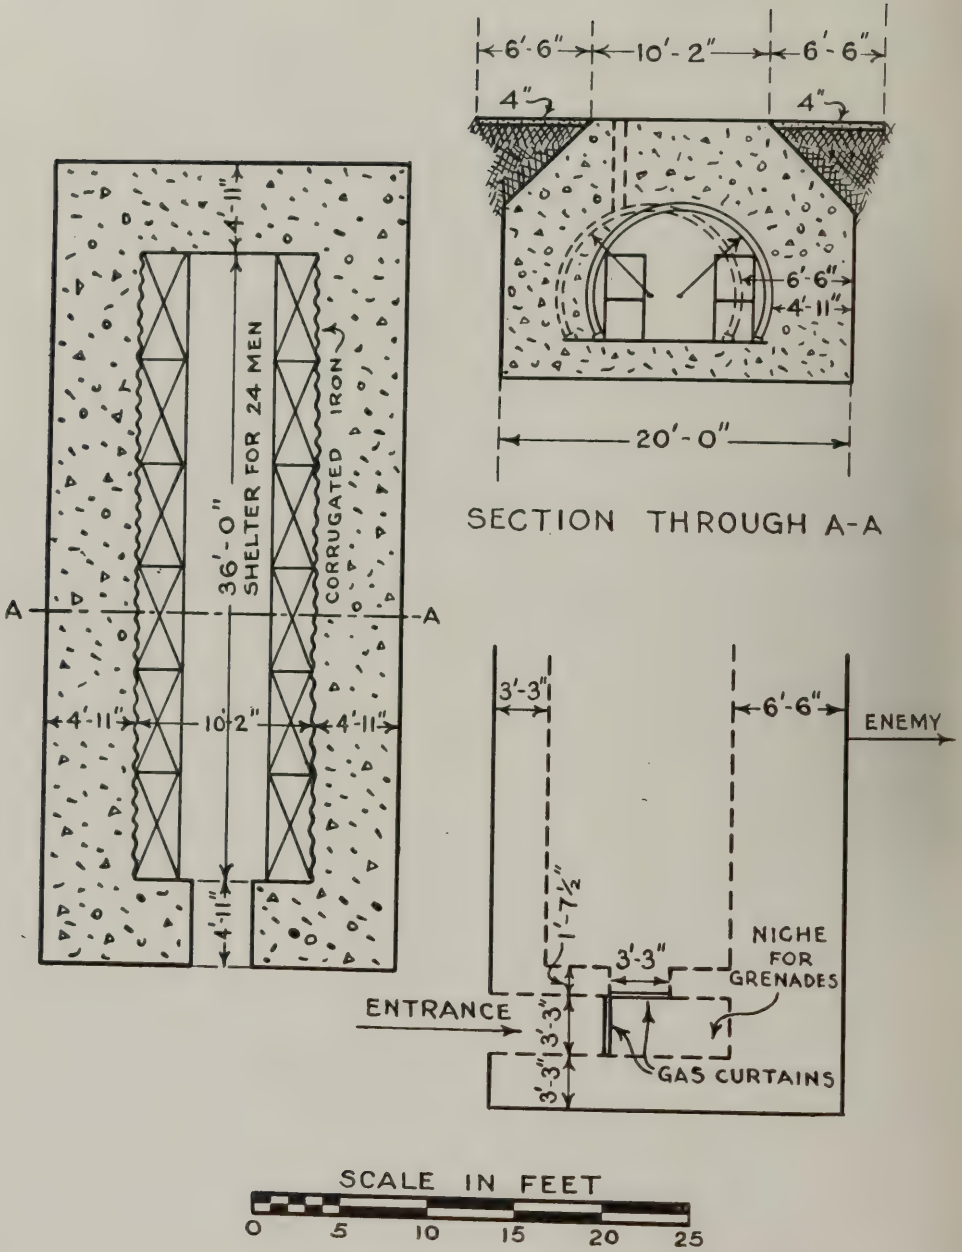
Concrete shelter built by Engineers, A. E. F.
